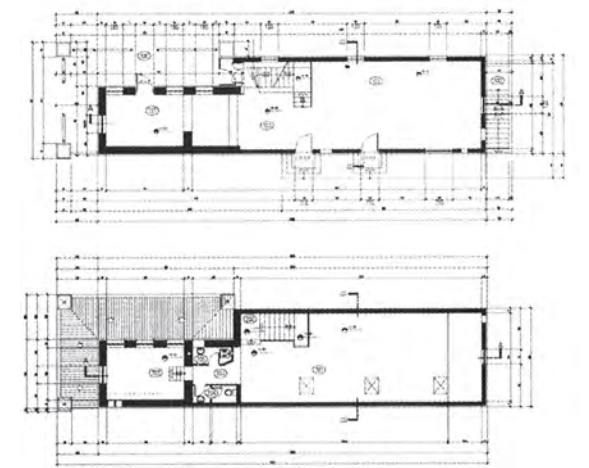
Railway station "Kaiserstraße"; ground and first floor plan.
